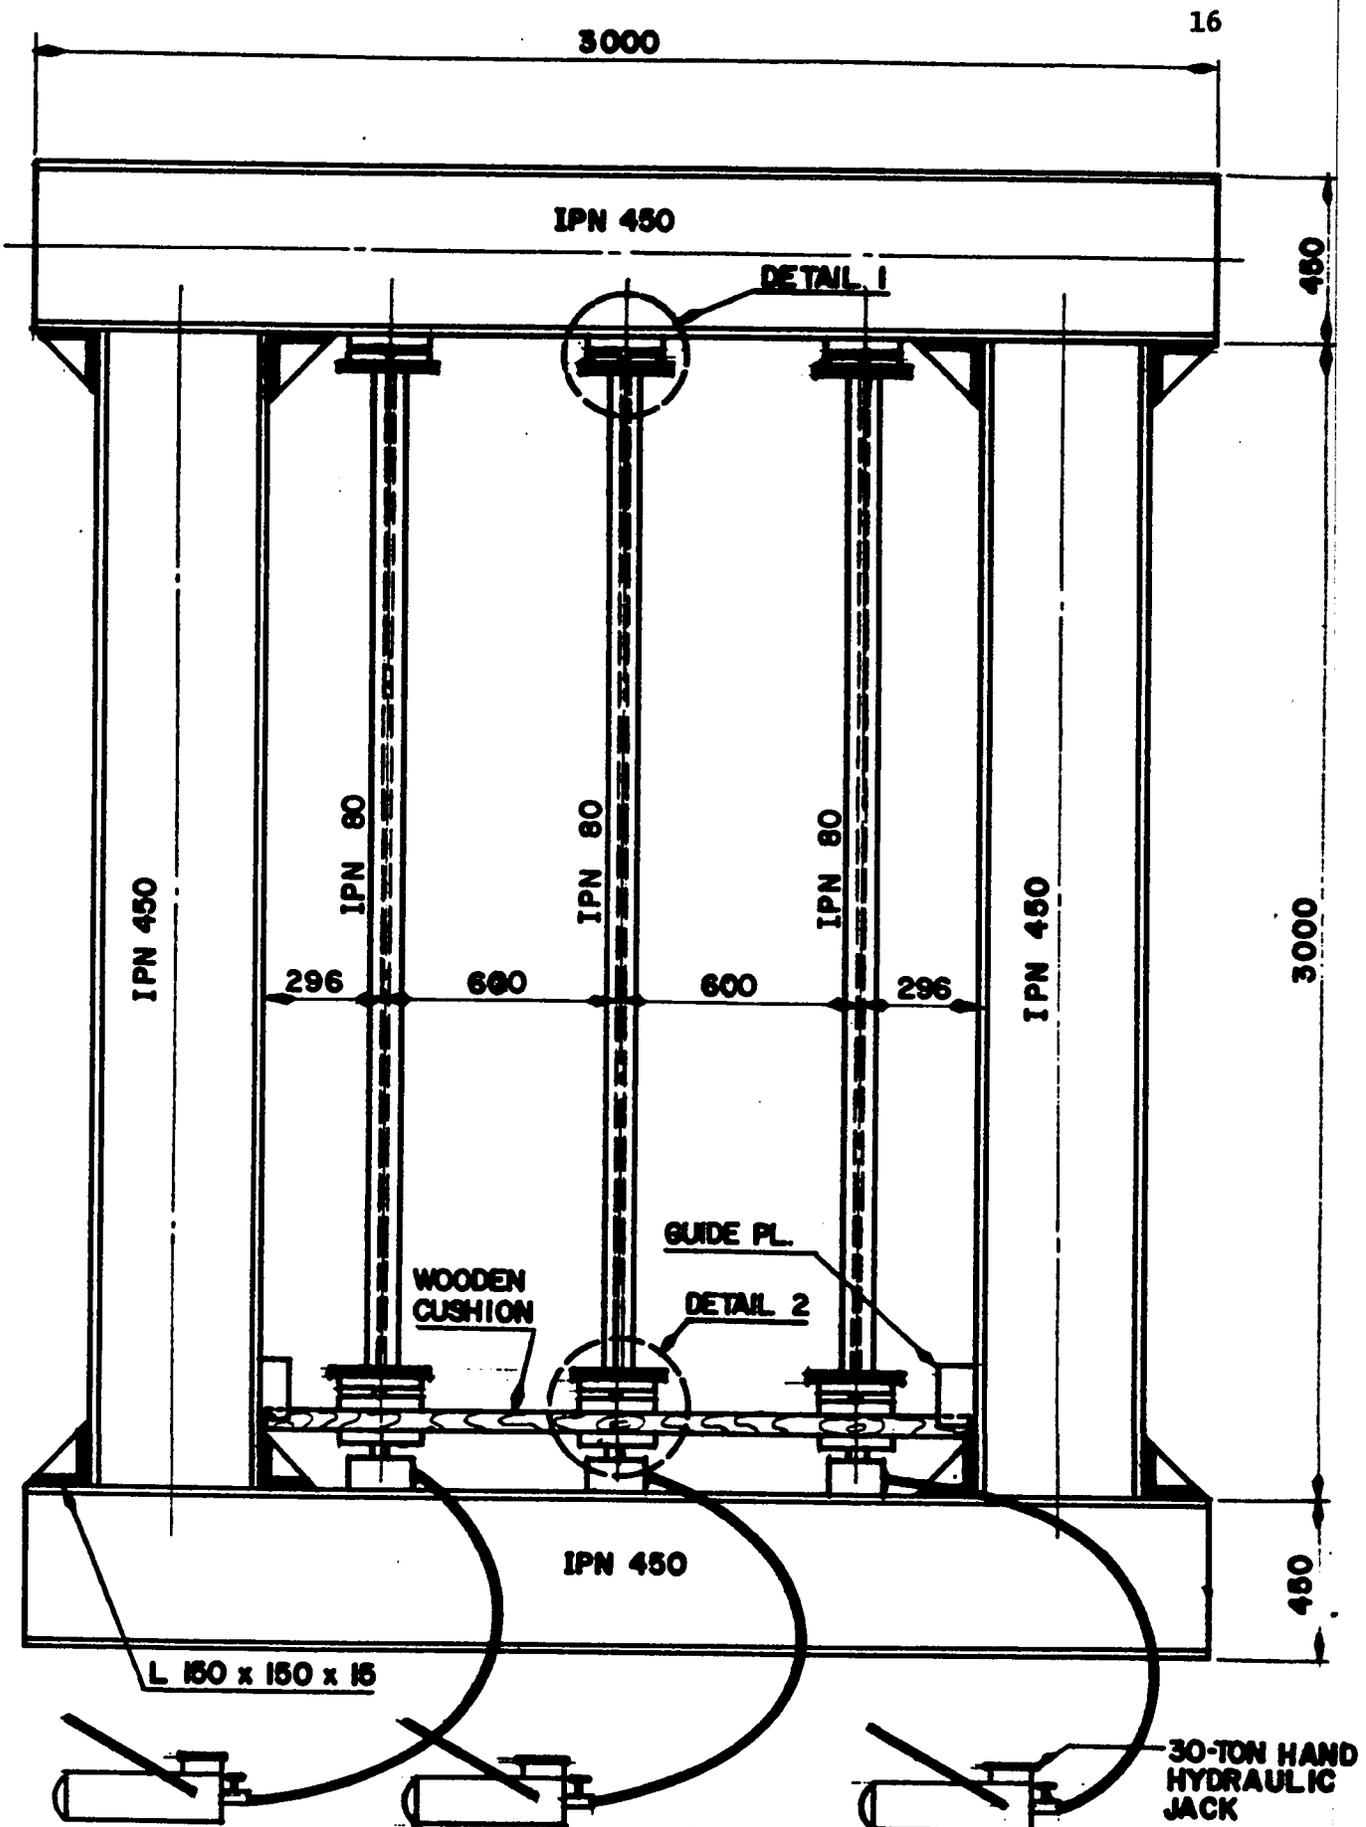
PLAN - ARRANGEMENT OF A DOUBLE-INTERBRACED SYSTEM
